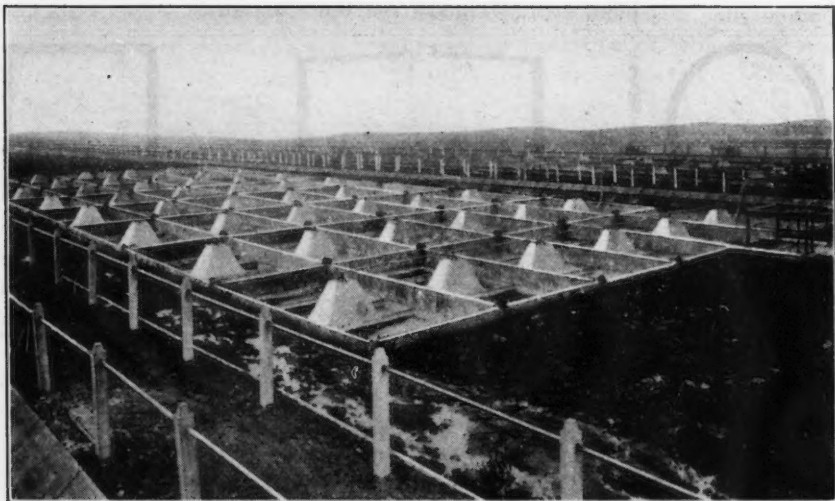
FLOATING CONCRETE COVERS ON SLUDGE TANKS, AT BIRMINGHAM, ENGLAND
